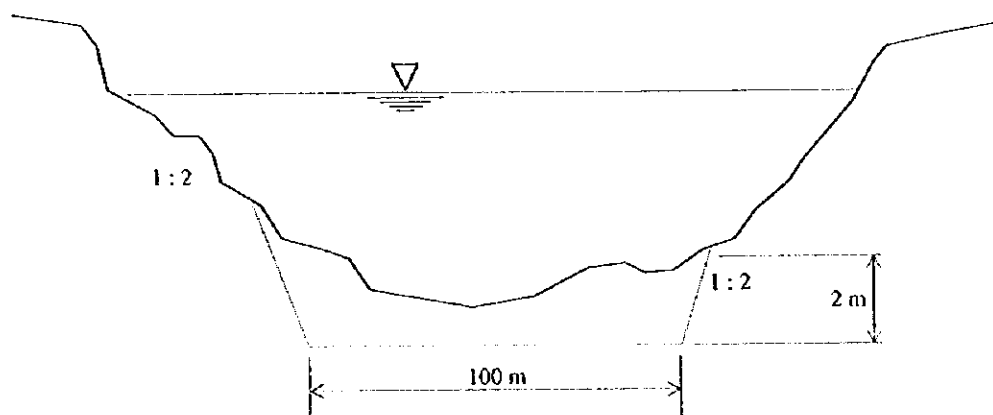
Standard Cross Section of Dredging (Sigatoka)
